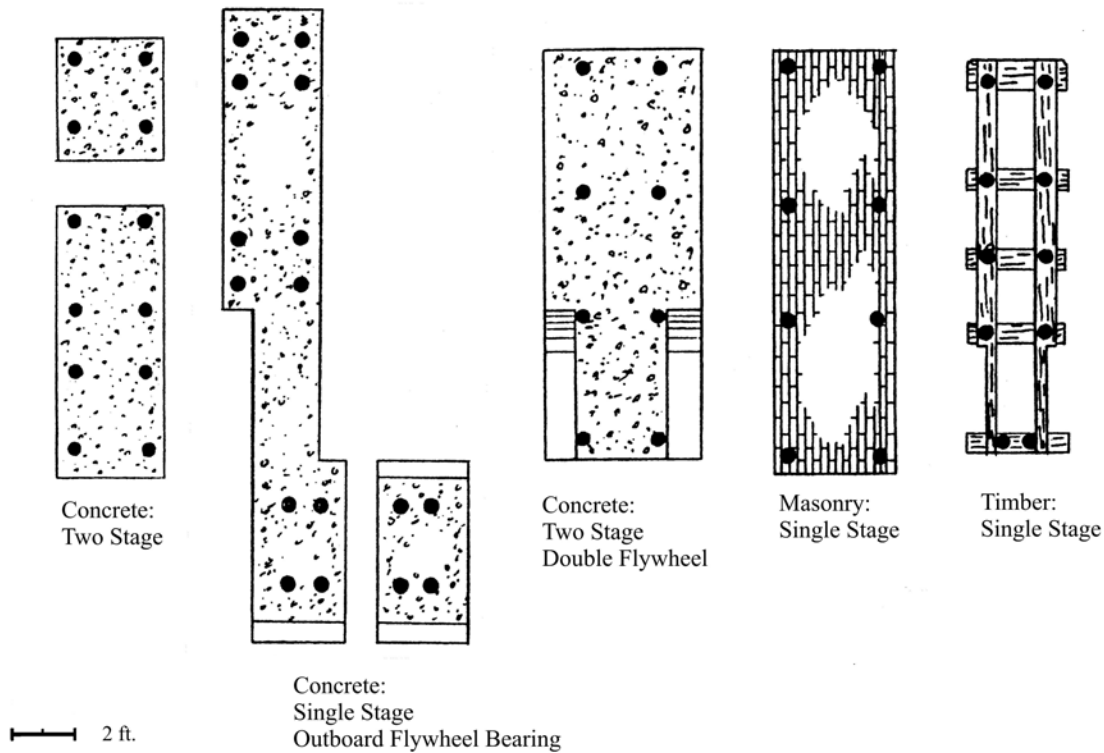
Plan views of foundations for straight-line steam compressors. Twitty, *Riches to Rust*, 107, 145.
